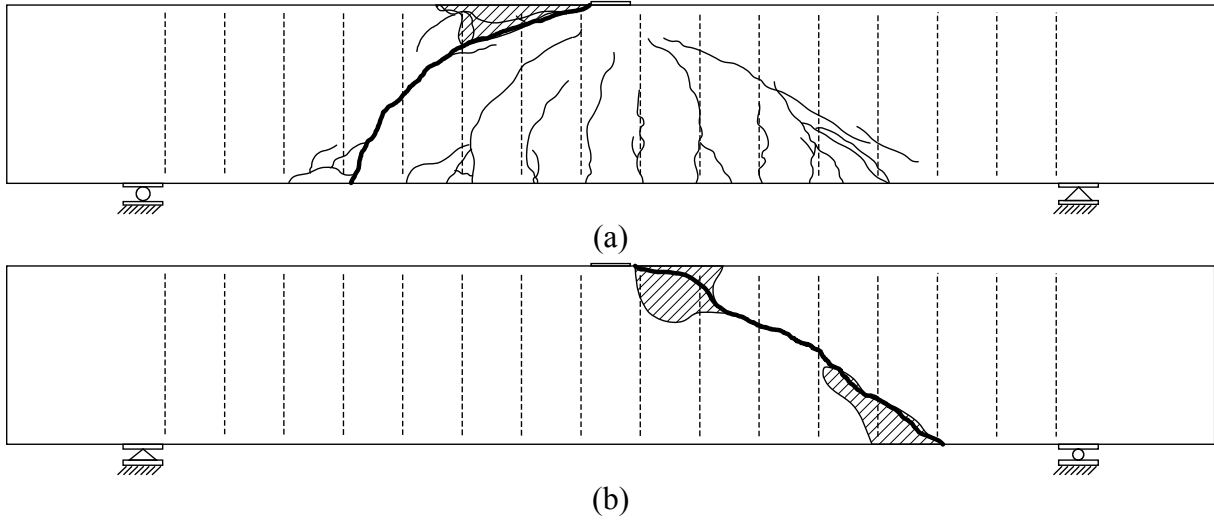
Observed damage in specimen P1S6, (a) front side, (b) back side
